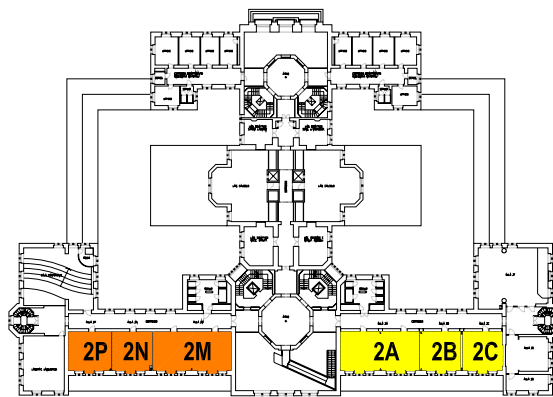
Building layout (east wing: traditional classrooms; west wing: automated classrooms)
